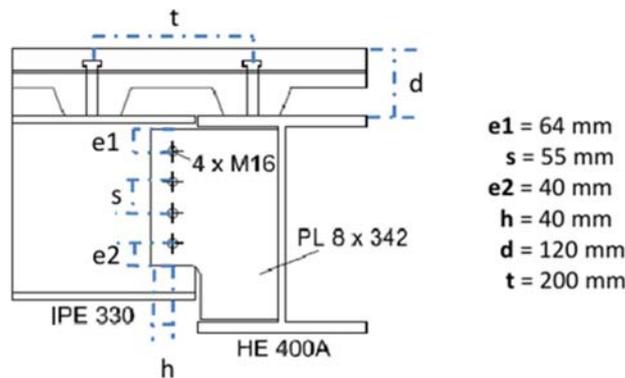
IPE330 Secondary beam - HEA400 primary beam shear connection detail.
